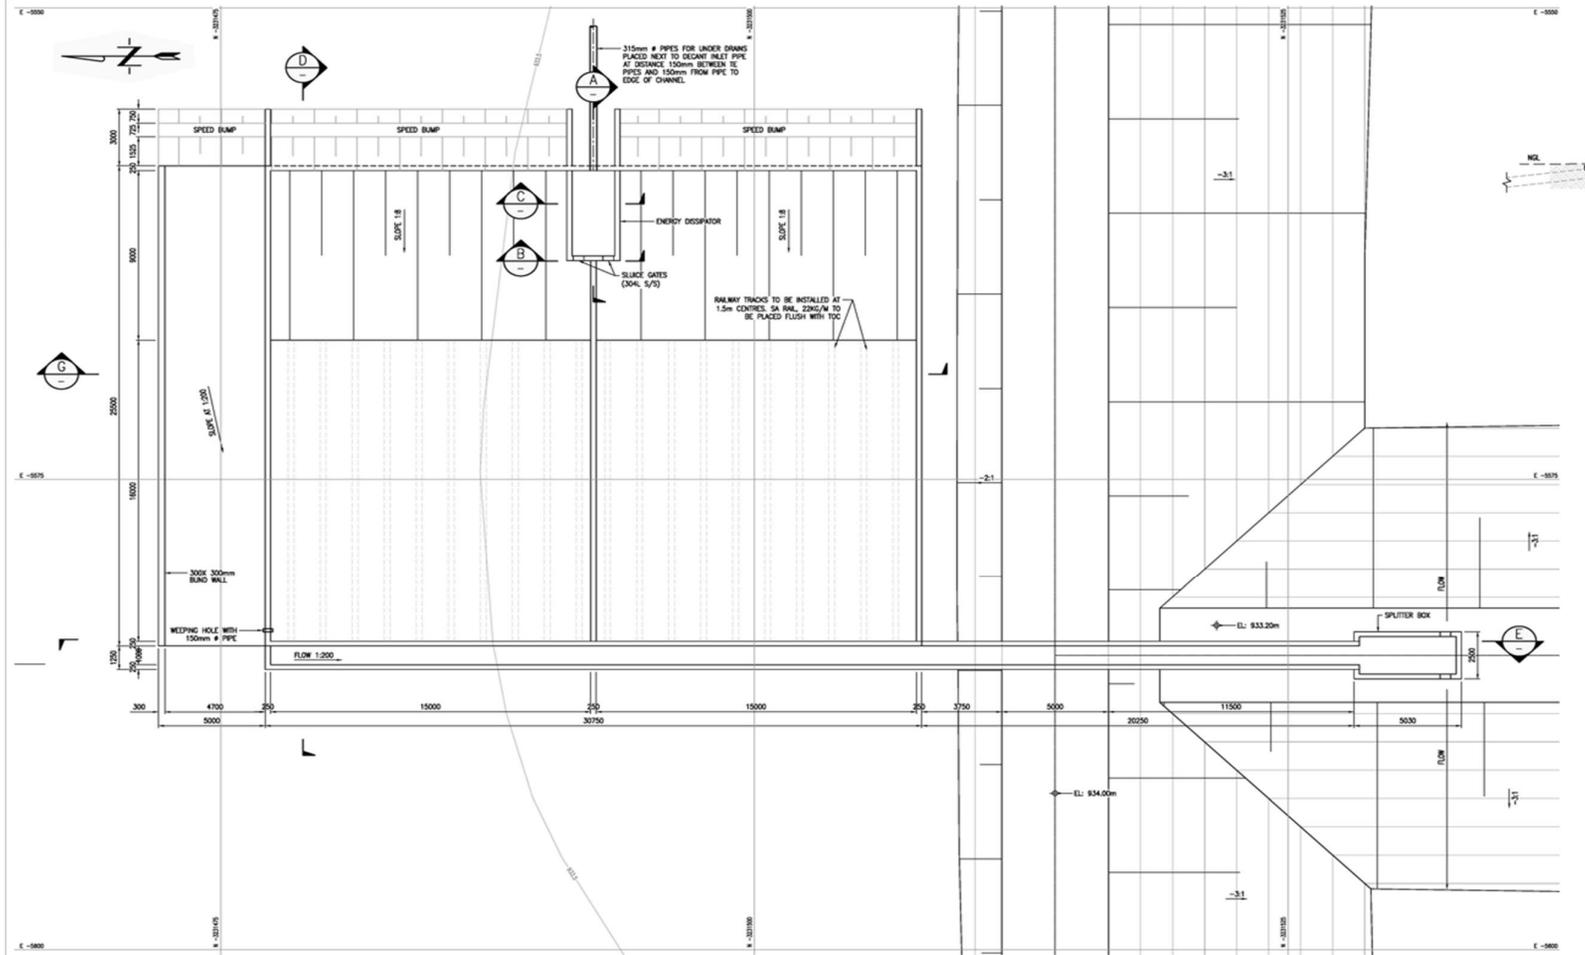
Double Silt Trap and Drying Bed at the Return Water Dam
